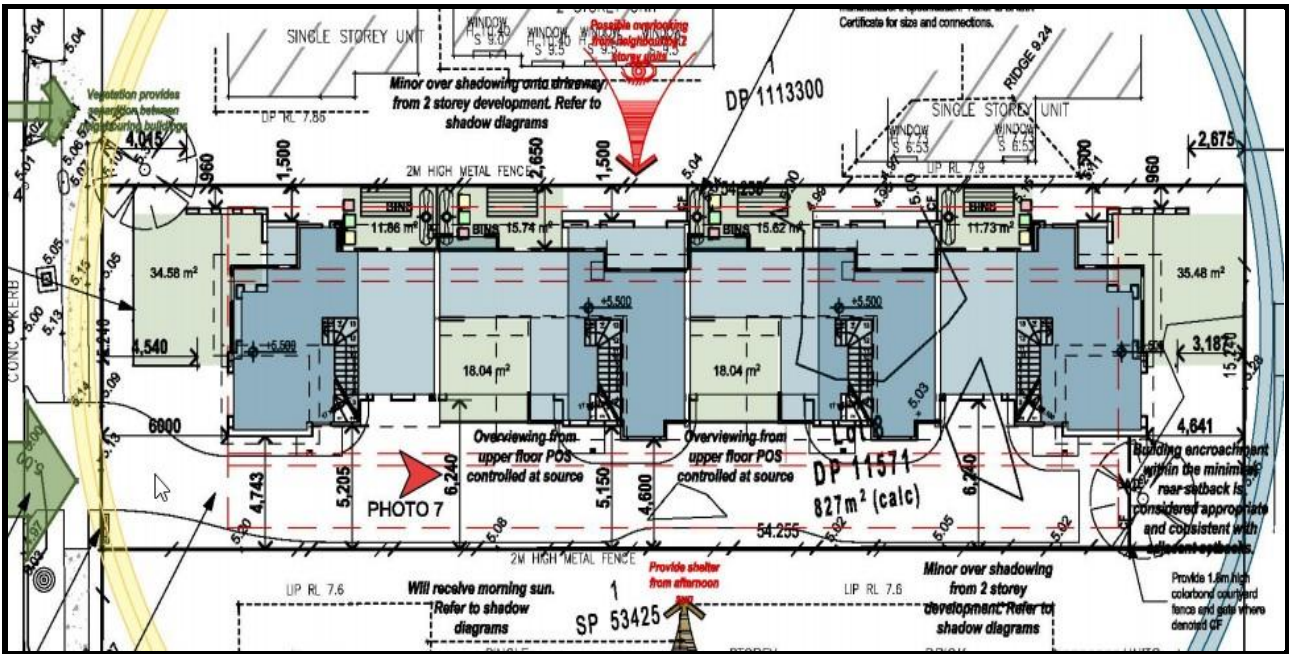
DA52851/2017 – 180 Bourke Road, Umina Beach – multi-dwelling development with a 2 storey setback of 1.5m. Approved 17 December 2018.
